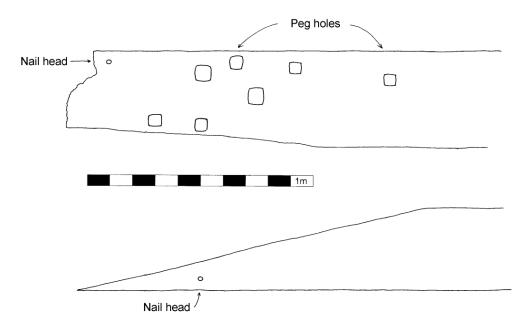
Elevation (above) and plan (below) of the east end of the timber in cut AE east side. (Drawing with missing peg-hole added from a photo).
